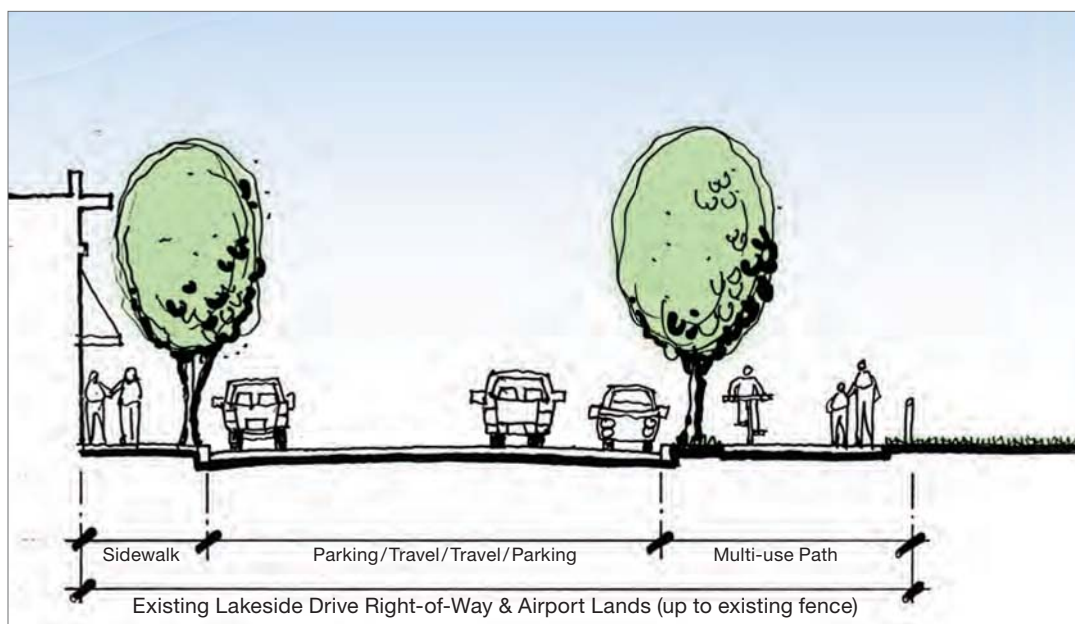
Lakeside Drive at Chahko Mika Mall, Proposed Cross Section (see Section 4.1 for recommended dimensions)
